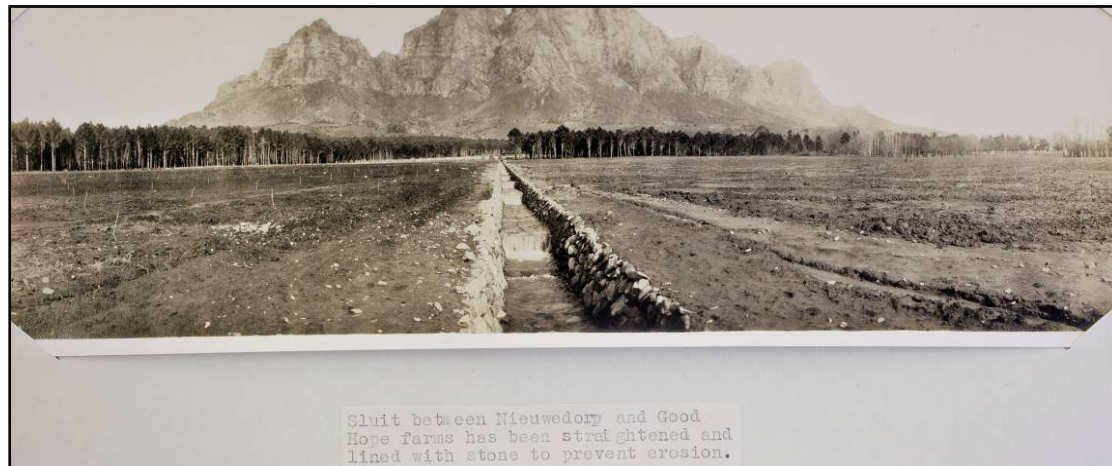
An example of the stone lined “leiwater” or “sluite” which were constructed between Nieuwedorp and Good Hope farms in the 1960s. The exact location of this particular furrow has not been determined (Titlestad 2007/2008).
